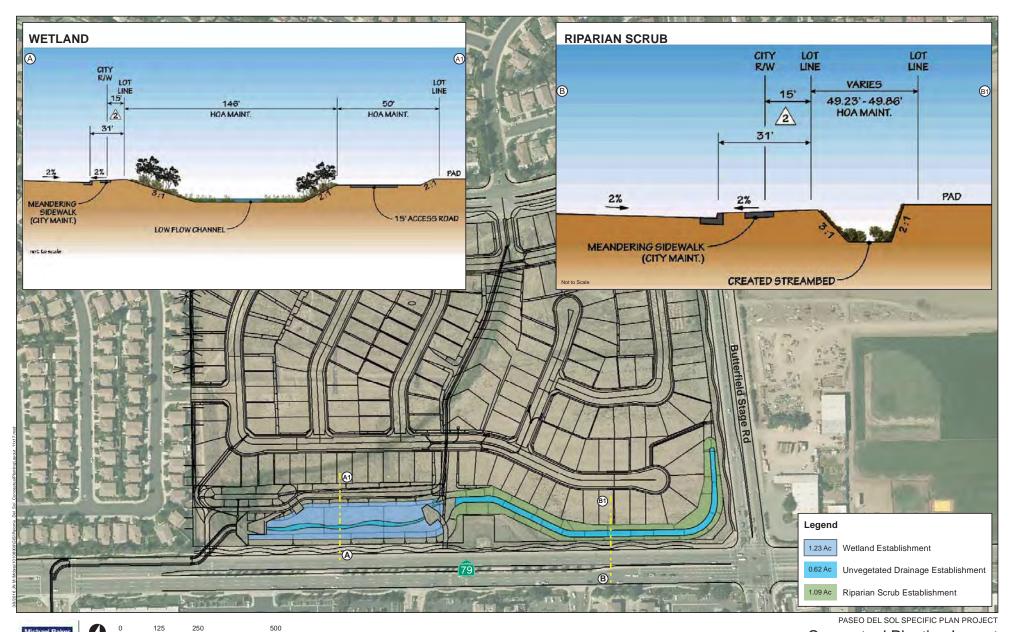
Mitigation Site Exhibit 5 – Conceptual Planting Layout
